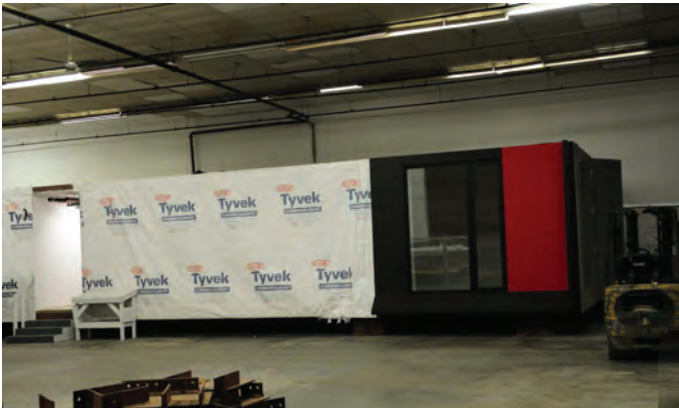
Module ready for shipment to site with weather protection and façades installed. (Source: Arup)
